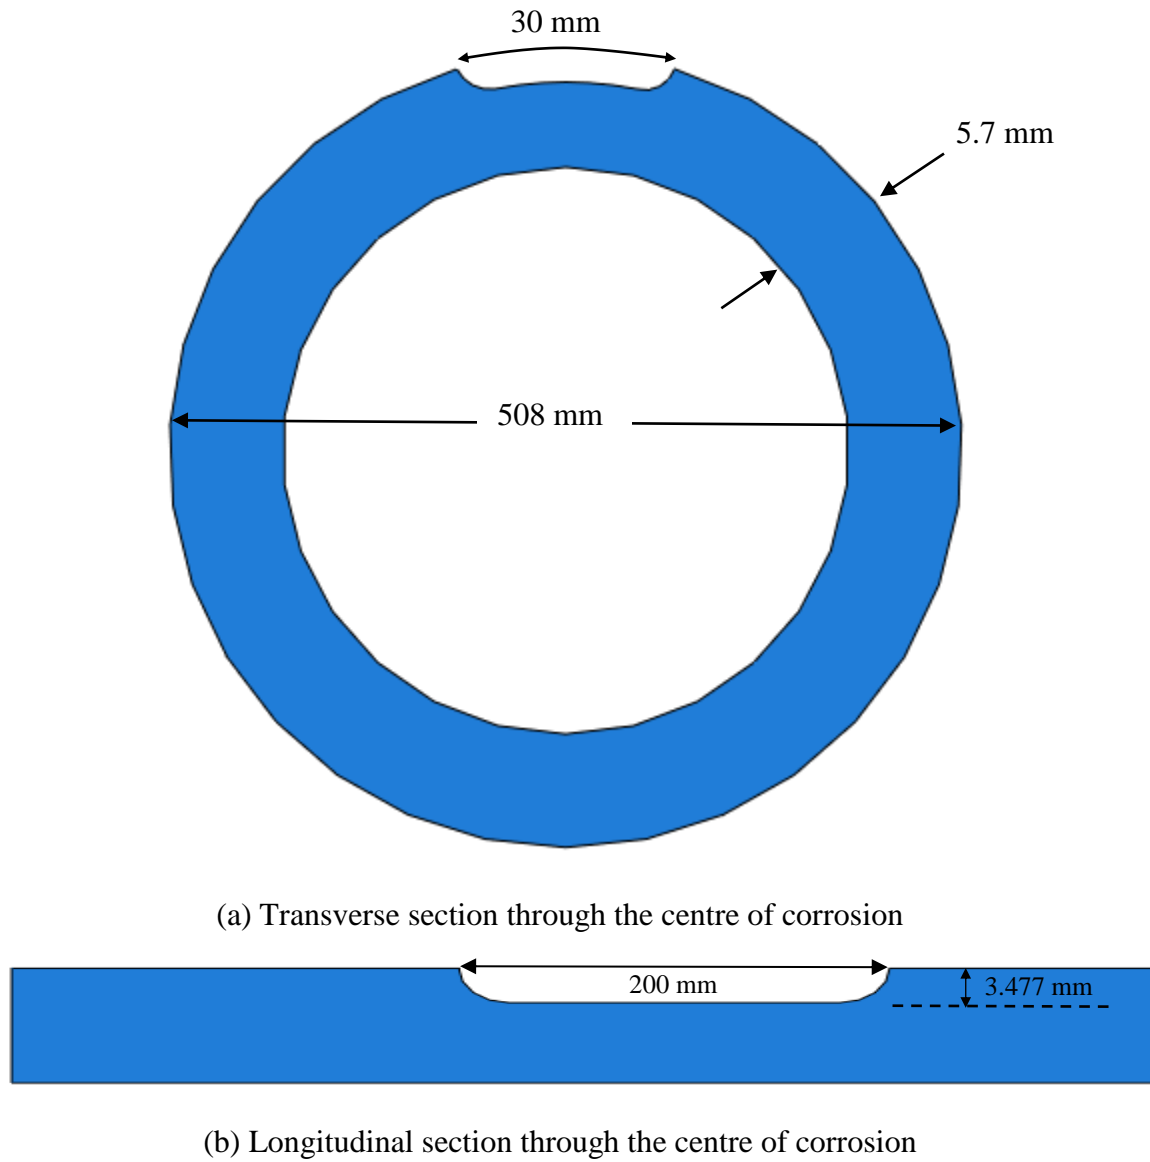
Sectional view of pipe with corrosion defect (Not to scale)
